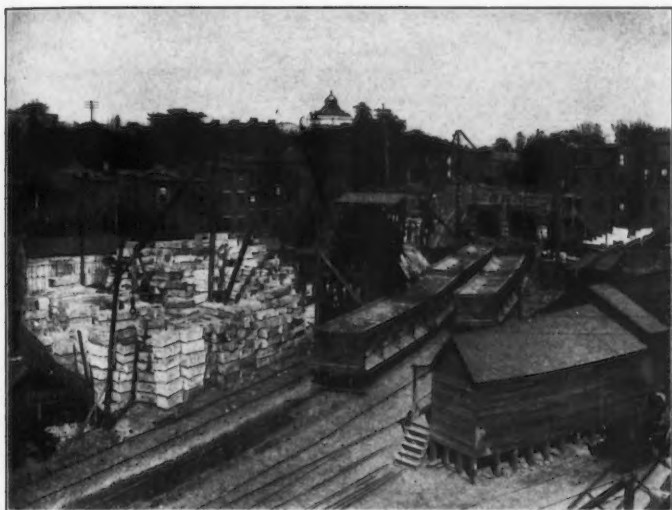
WASHINGTON TERMINAL STATION: STORAGE YARD AND ENTRANCE TO TUNNEL,
